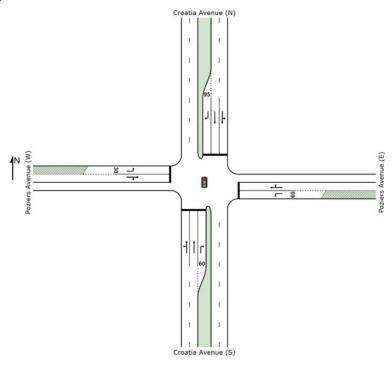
2026 Croatia Avenue/ Poziers Avenue Layout
